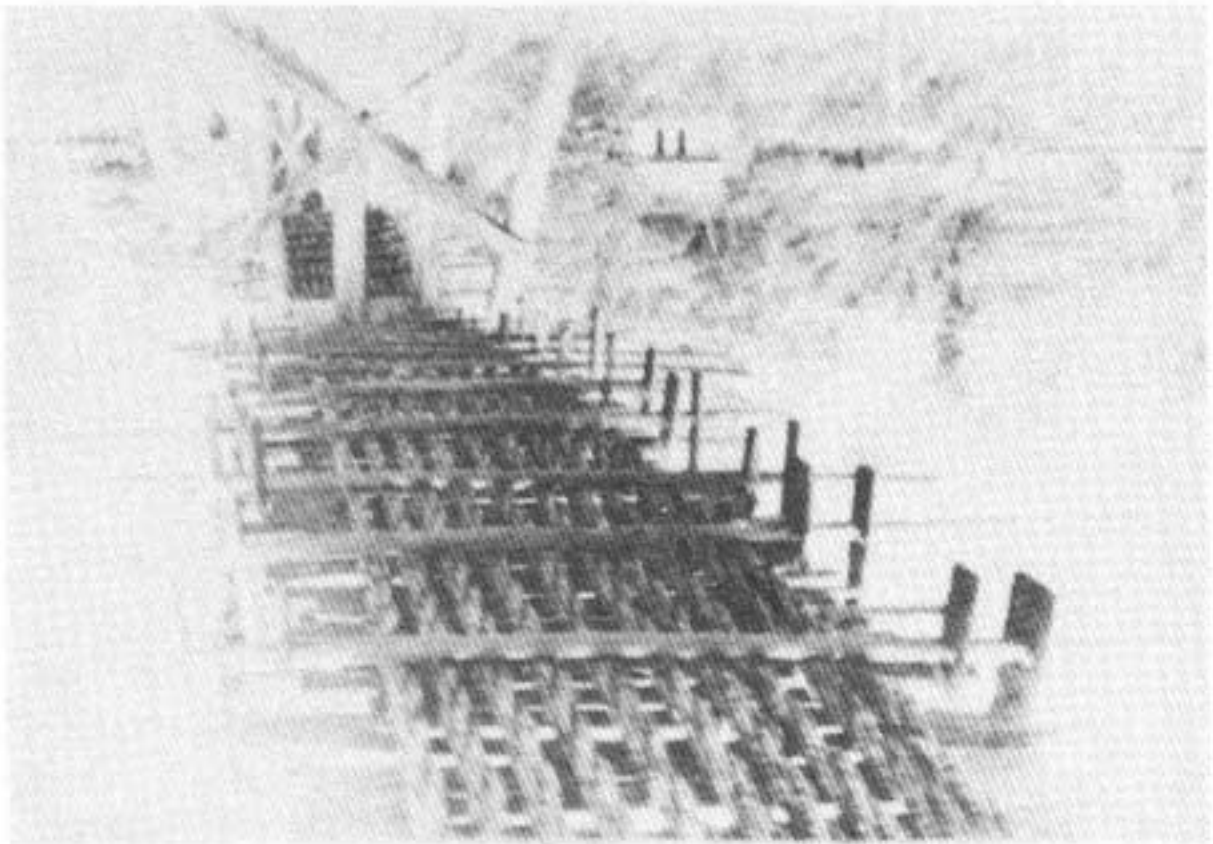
Chinese suspension bridge made with bamboo cables (can be seen in the lower pan)
